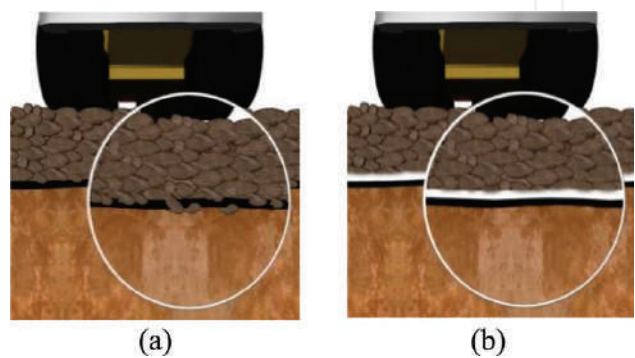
Failure with/without geotextile for pavement protection. (a) Without geotextile and (b) With geotextile.
